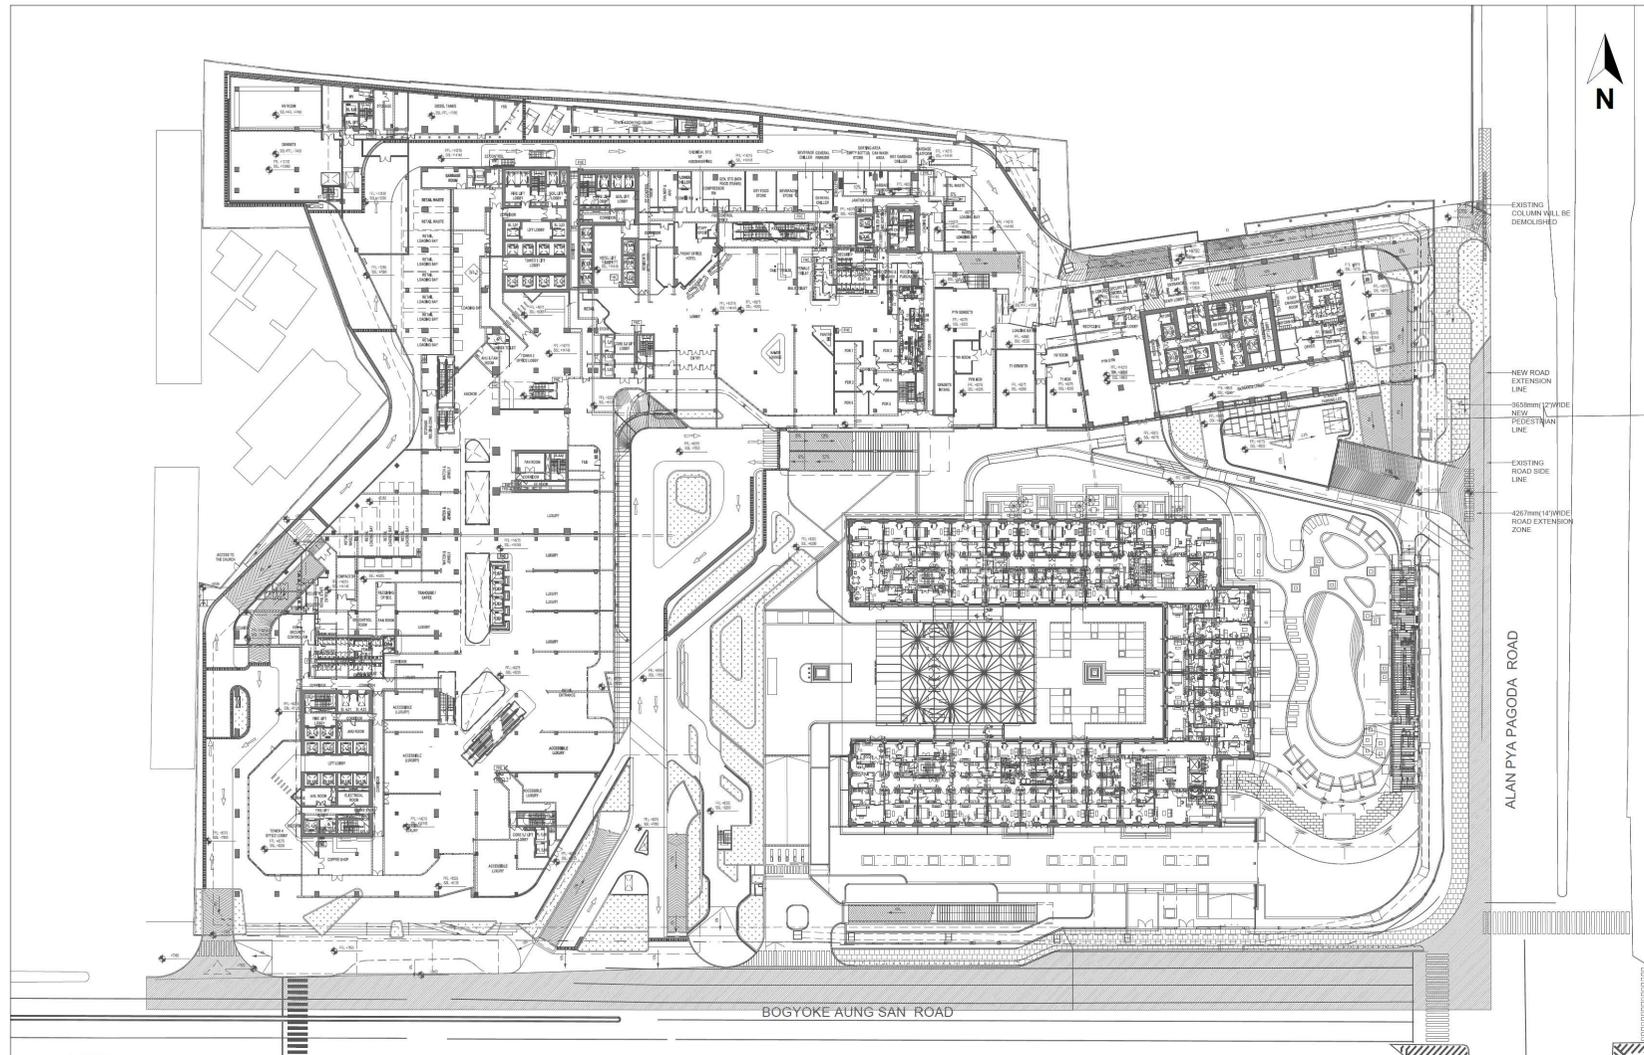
Ground Floor Layout (L1) with L2 overlay
